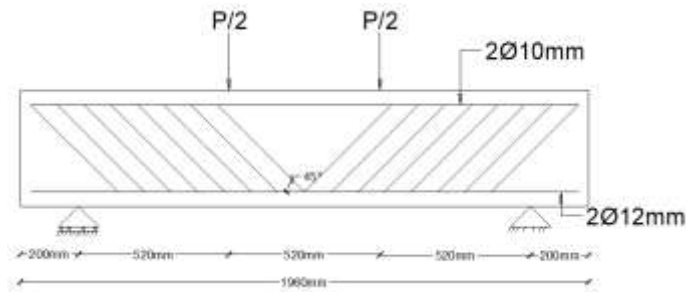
Longitudinal Profile of the inclined stirrup beam (ISB).
